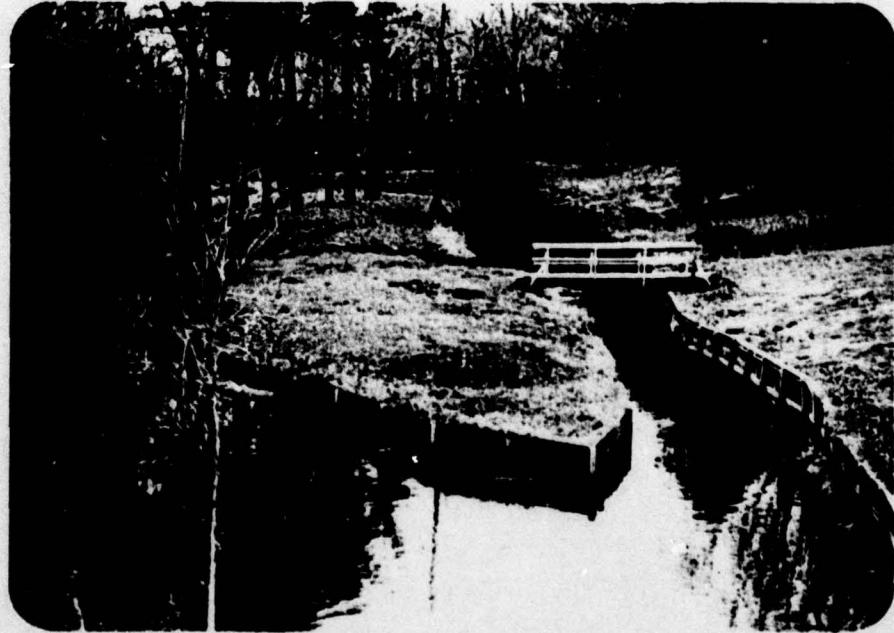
View downstream of overflow structure - downstream of box culvert
